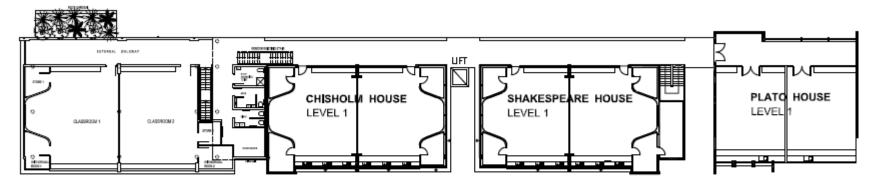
Plan and Elevations of the proposed modifications to the Master Plan.
